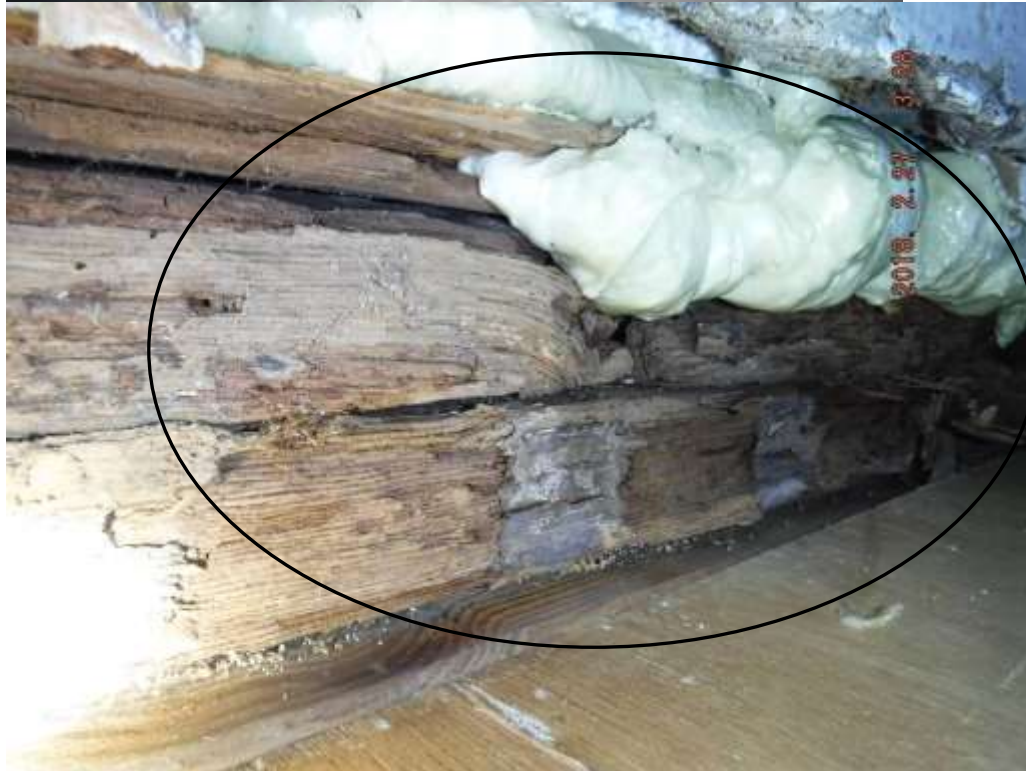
Moisture & carpenter ant damage to a beam on left side, mice droppings and carpenter ant frass.
